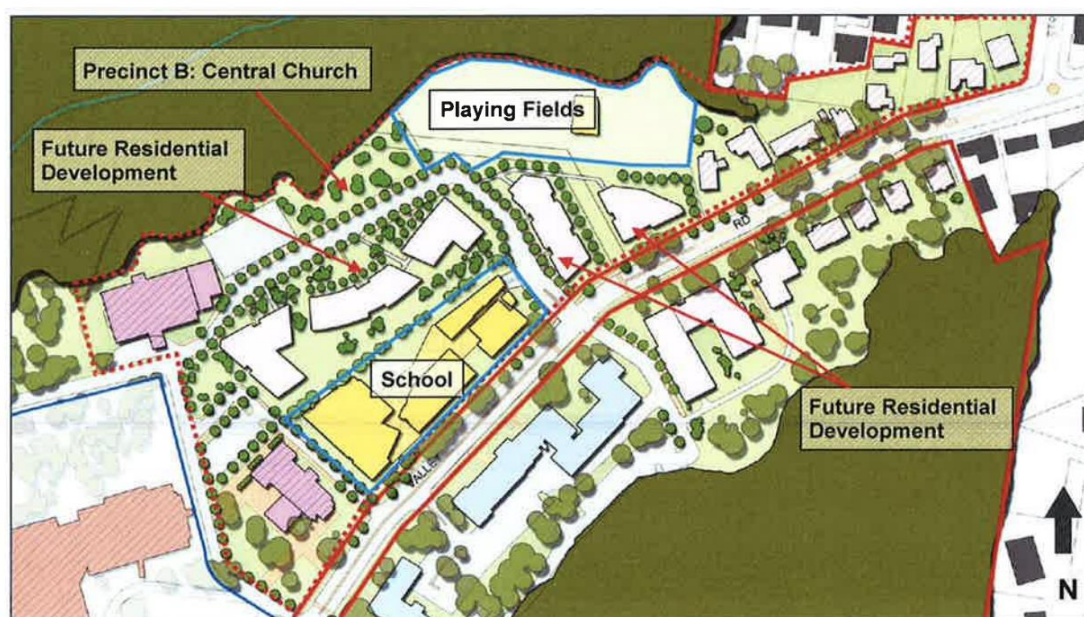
Wahroonga Estate Redevelopment – Precinct B Layout
